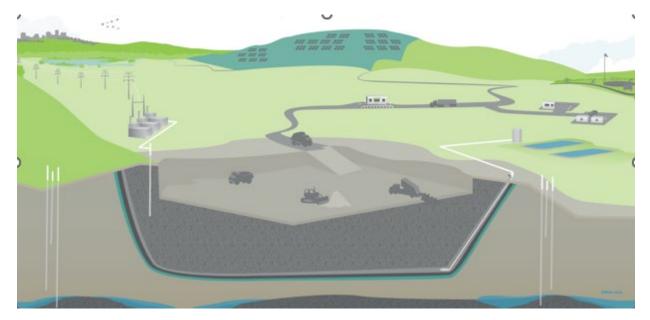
Typical Cross Section of a MSW Sanitary Landfill
